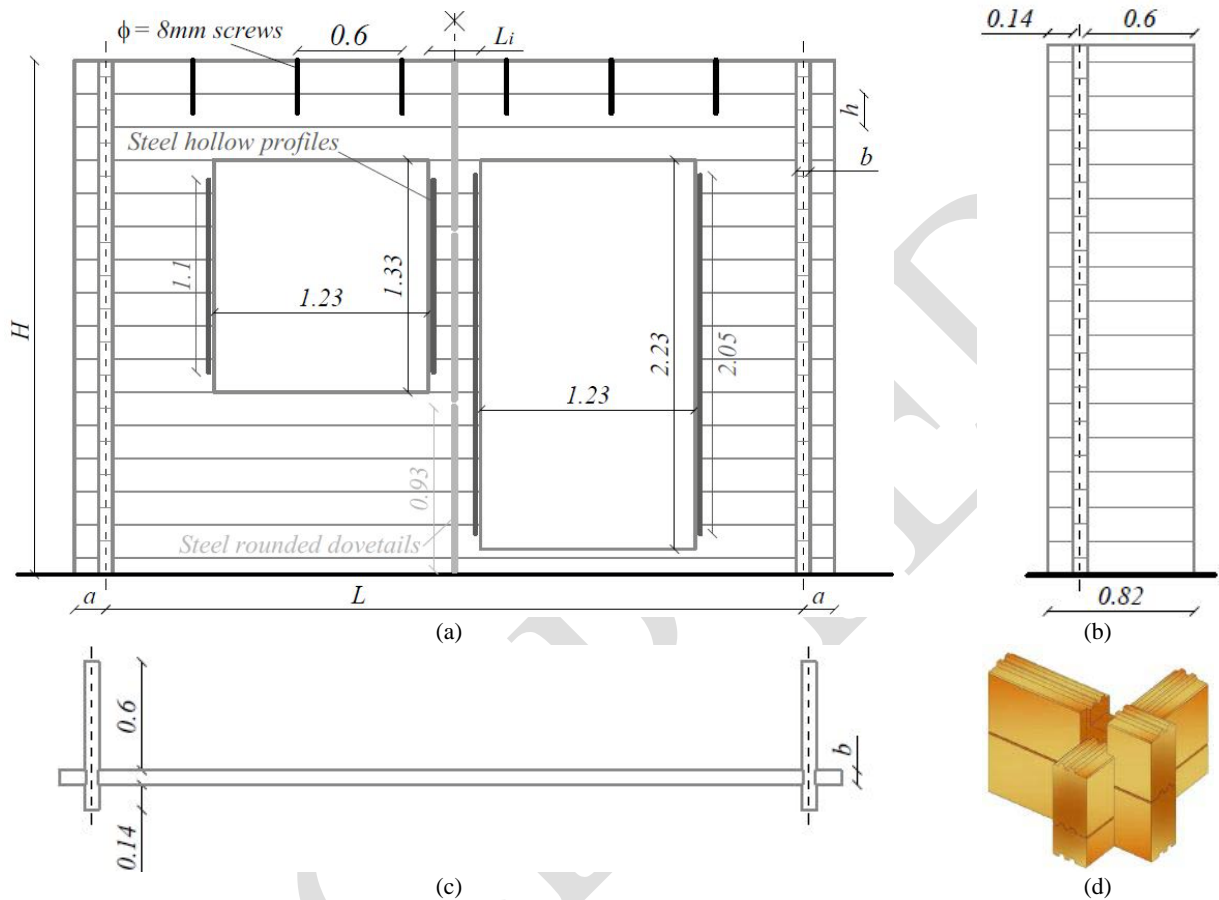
Typical layout of full-scale *Blockhaus* specimens W01-W04 [4].(a) elevation; (b) lateral view; (c) top view; (d) 'Standard' corner joint. Nominal dimensions in m.
